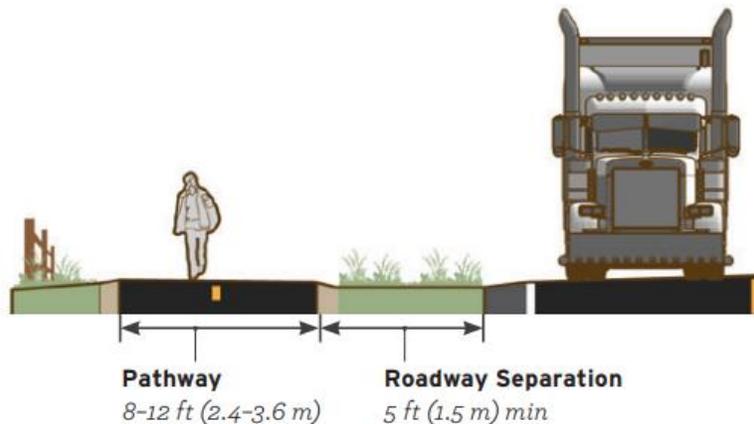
Trail Typical Section adjacent to roadway (image credit: Small Town and Rural Multimodal Networks, FHWA)
